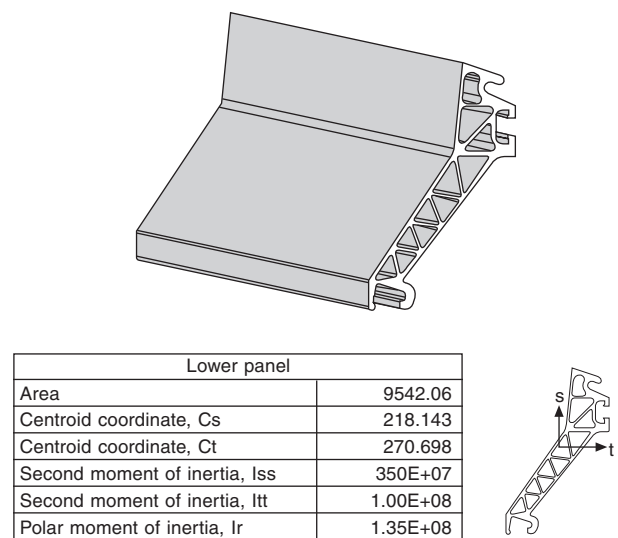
Three-dimensional model, cross-section view and inertial properties of the lower truss-core panel of the aluminum bridge parapet.
